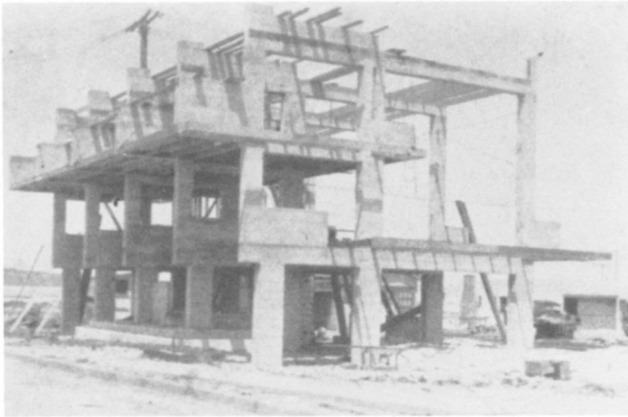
Rudolph Schindler, Beach House for Dr. and Mrs. Lovell, Newport Beach, 1922–1926, construction photo (University of California, Santa Barbara, Architectural Drawing Collection).
